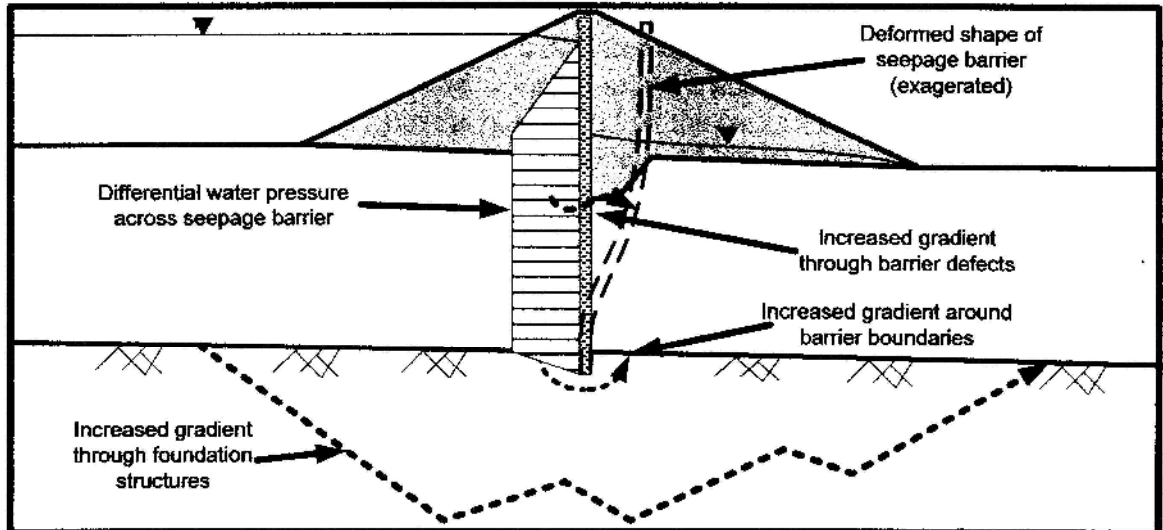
Development of differential water pressures and their effect on diaphragm wall leading to wall deflections and increased hydraulic gradients (Rice, 2009)
